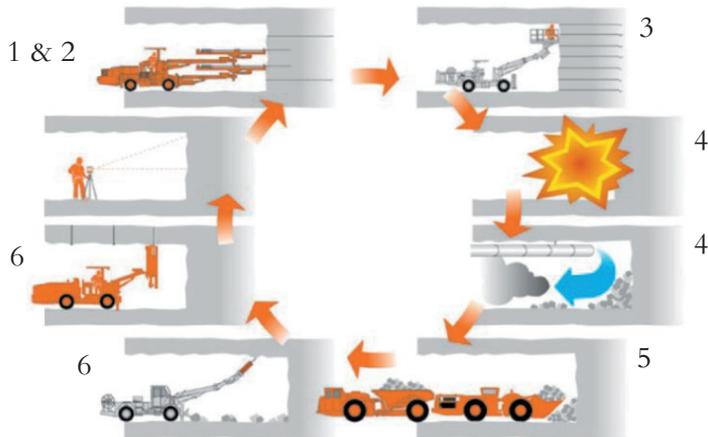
Excavation cycle in tunnel excavation (Modified after Tamrock, 1999).
